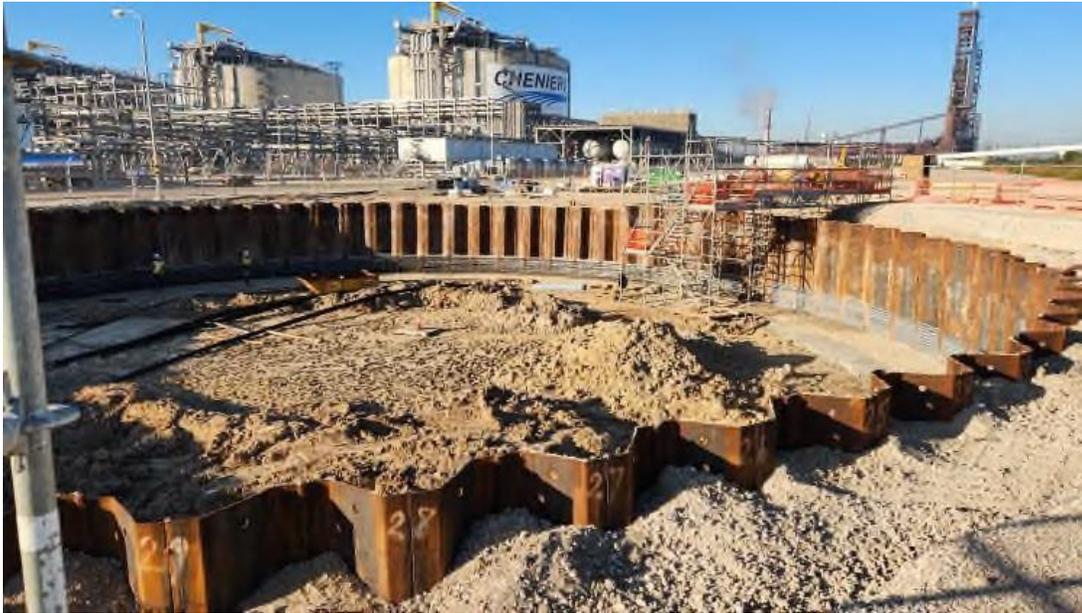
Area 310Q02 LNG Transfer Spill Impoundment Basin – Excavation (OSBL South)
